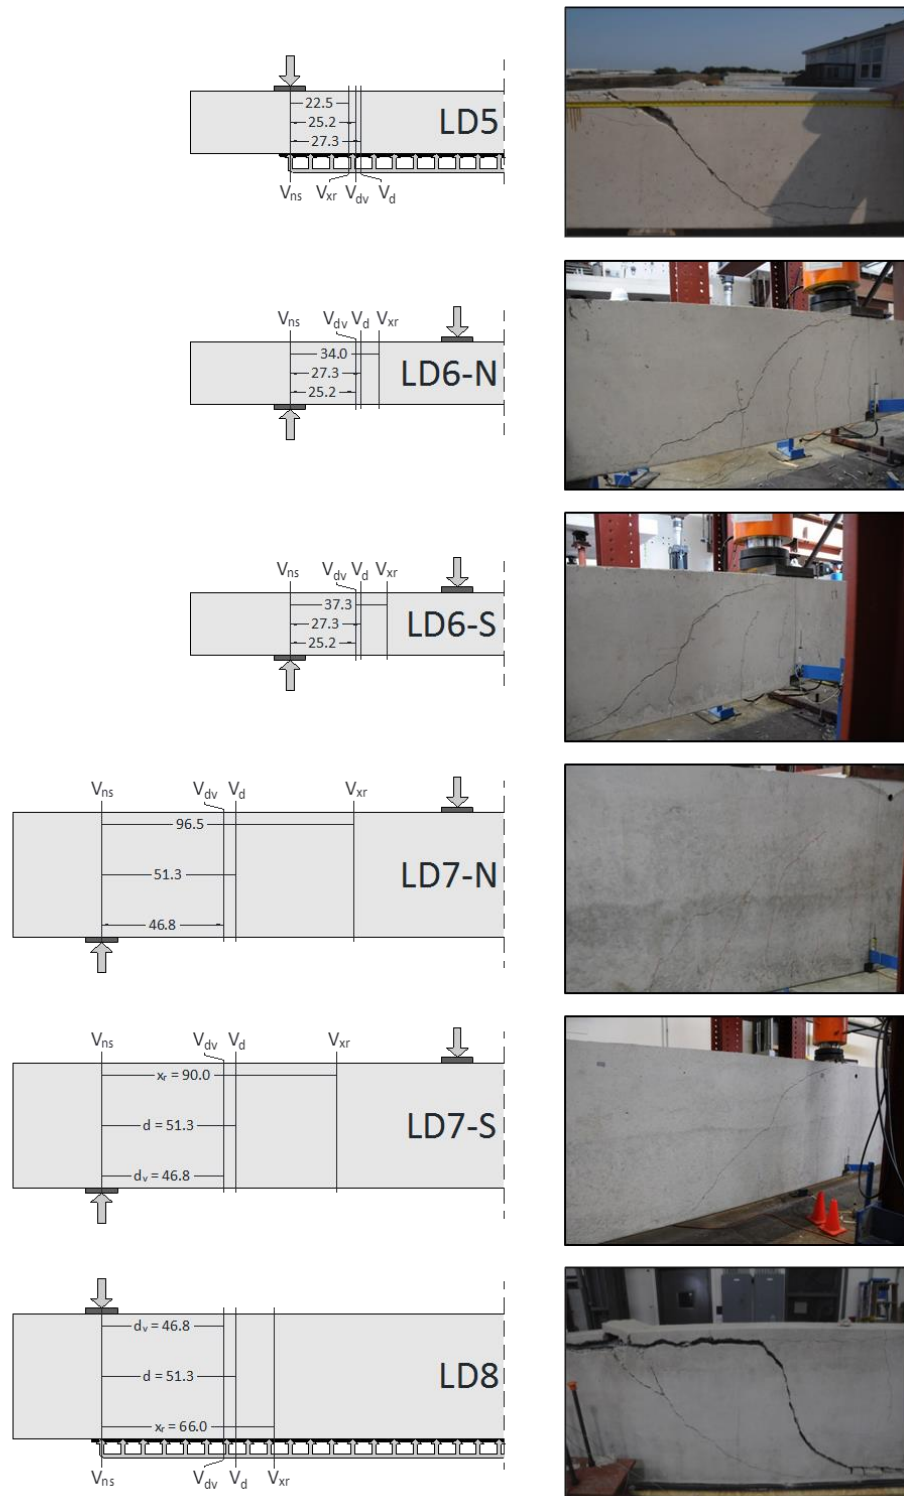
Shear Force Sections and Failure Crack Photo for Each Specimen
